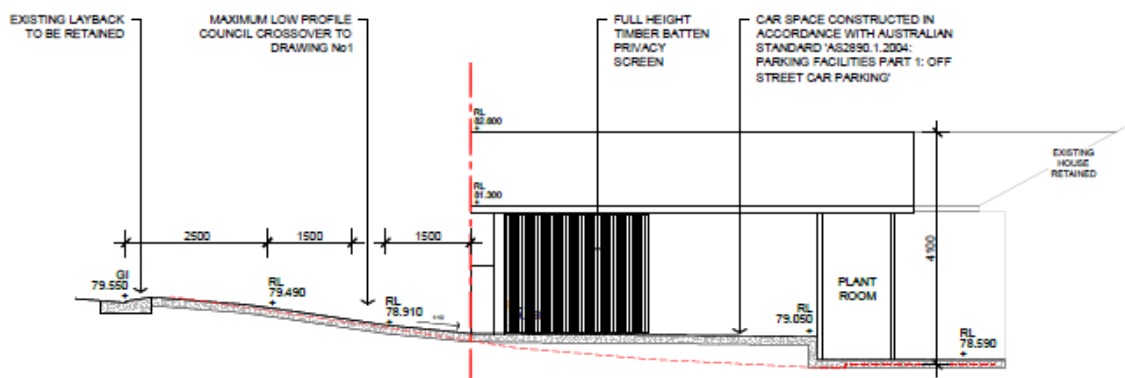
Extract from Plans (LPL_2730) showing the proposed crossover and driveway
